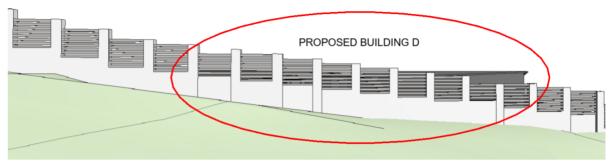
Elevation showing the proposed building D massing in Lady Penrhyn Drive.
